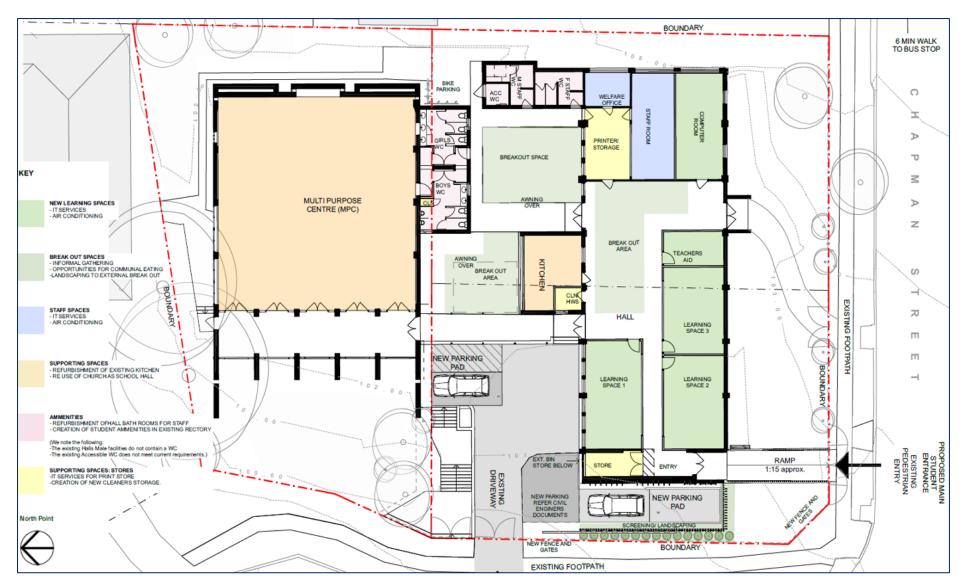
| Proposed internal layout and uses within the school (Source: Applicant's EIS)
